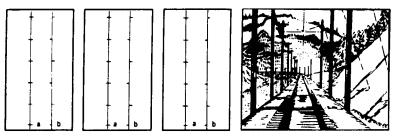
Single-Track Railroad, Nonoperating. Labeling indicates whether railroad is abandoned, destroyed, or under construction.
